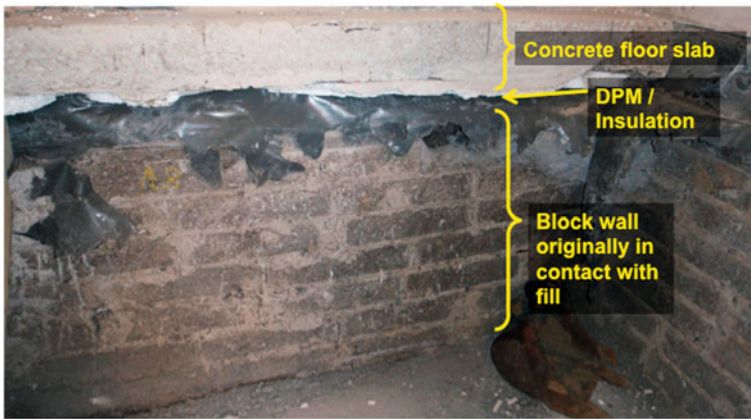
Exposed internal foundations constructed from concrete blocks on a concrete footing
